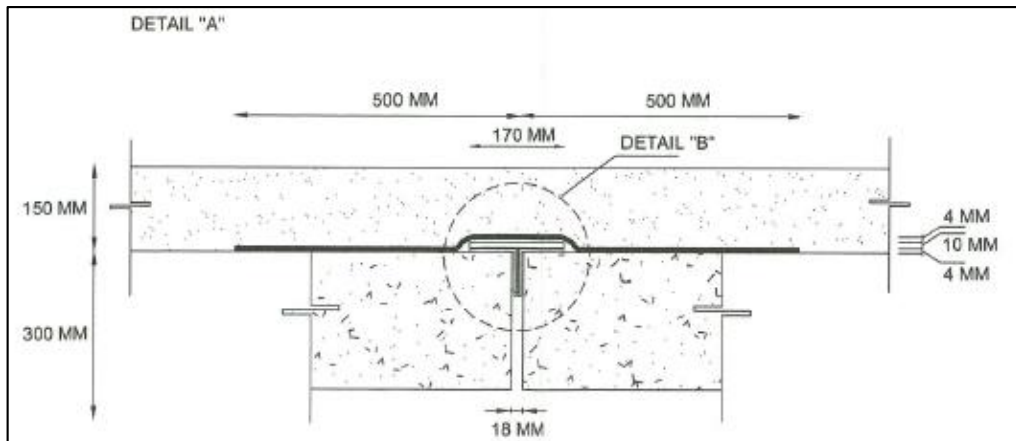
A detail of setting up of membrane over the expansion joints in bridge structure
